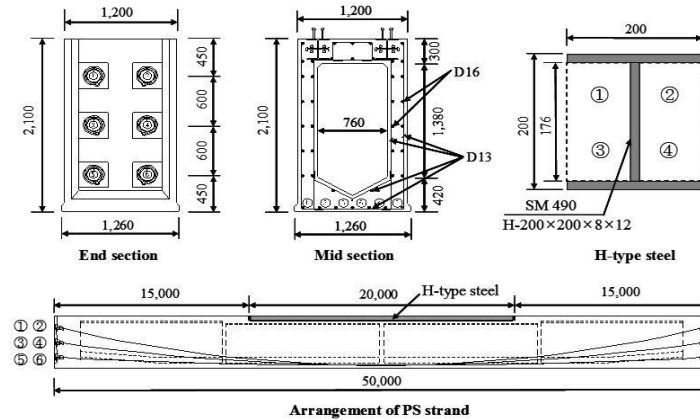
Sectional dimensions, reinforcing rebar, and PS strand arrangement (unit: mm)
